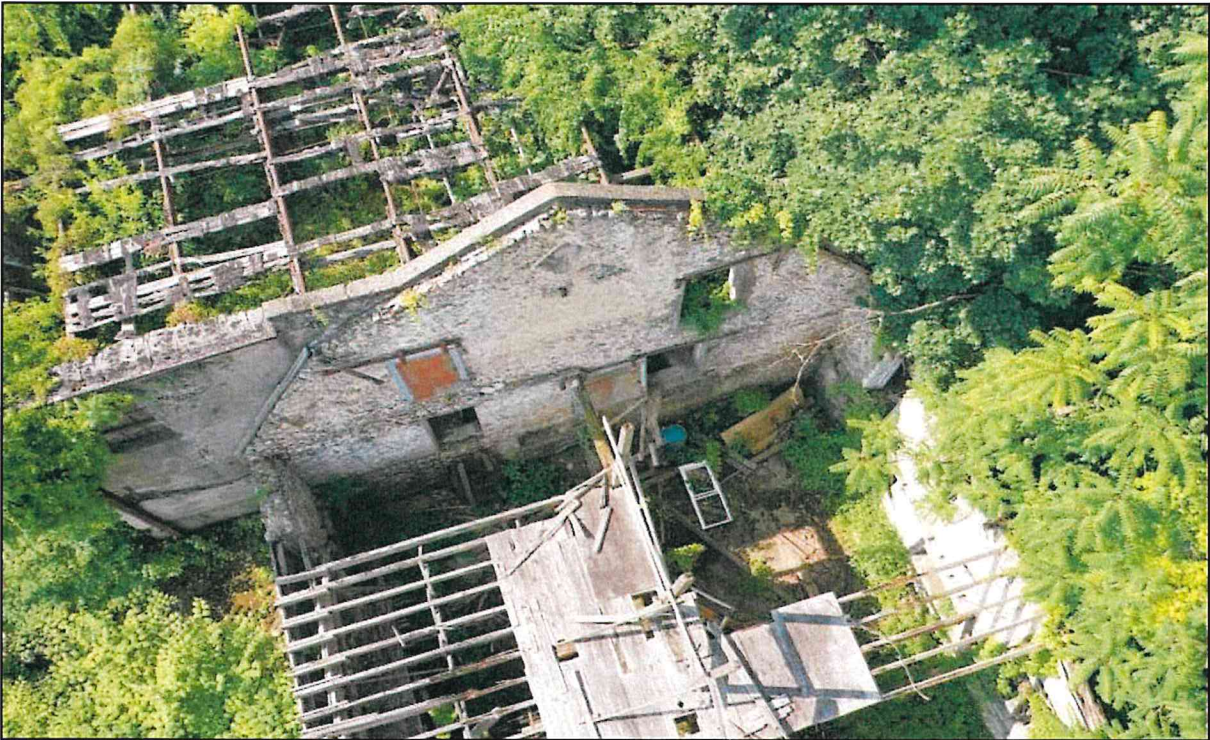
Drone View of the Ice House building from overhead. Exposed structural members and deterioration of the flooring are clearly visible.
